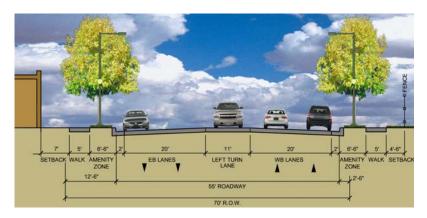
Existing Cross Section Center. This is the existing typical 4-lane cross section for 38th Avenue in the center of the study area, roughly between Pierce Street and Depew Street.
